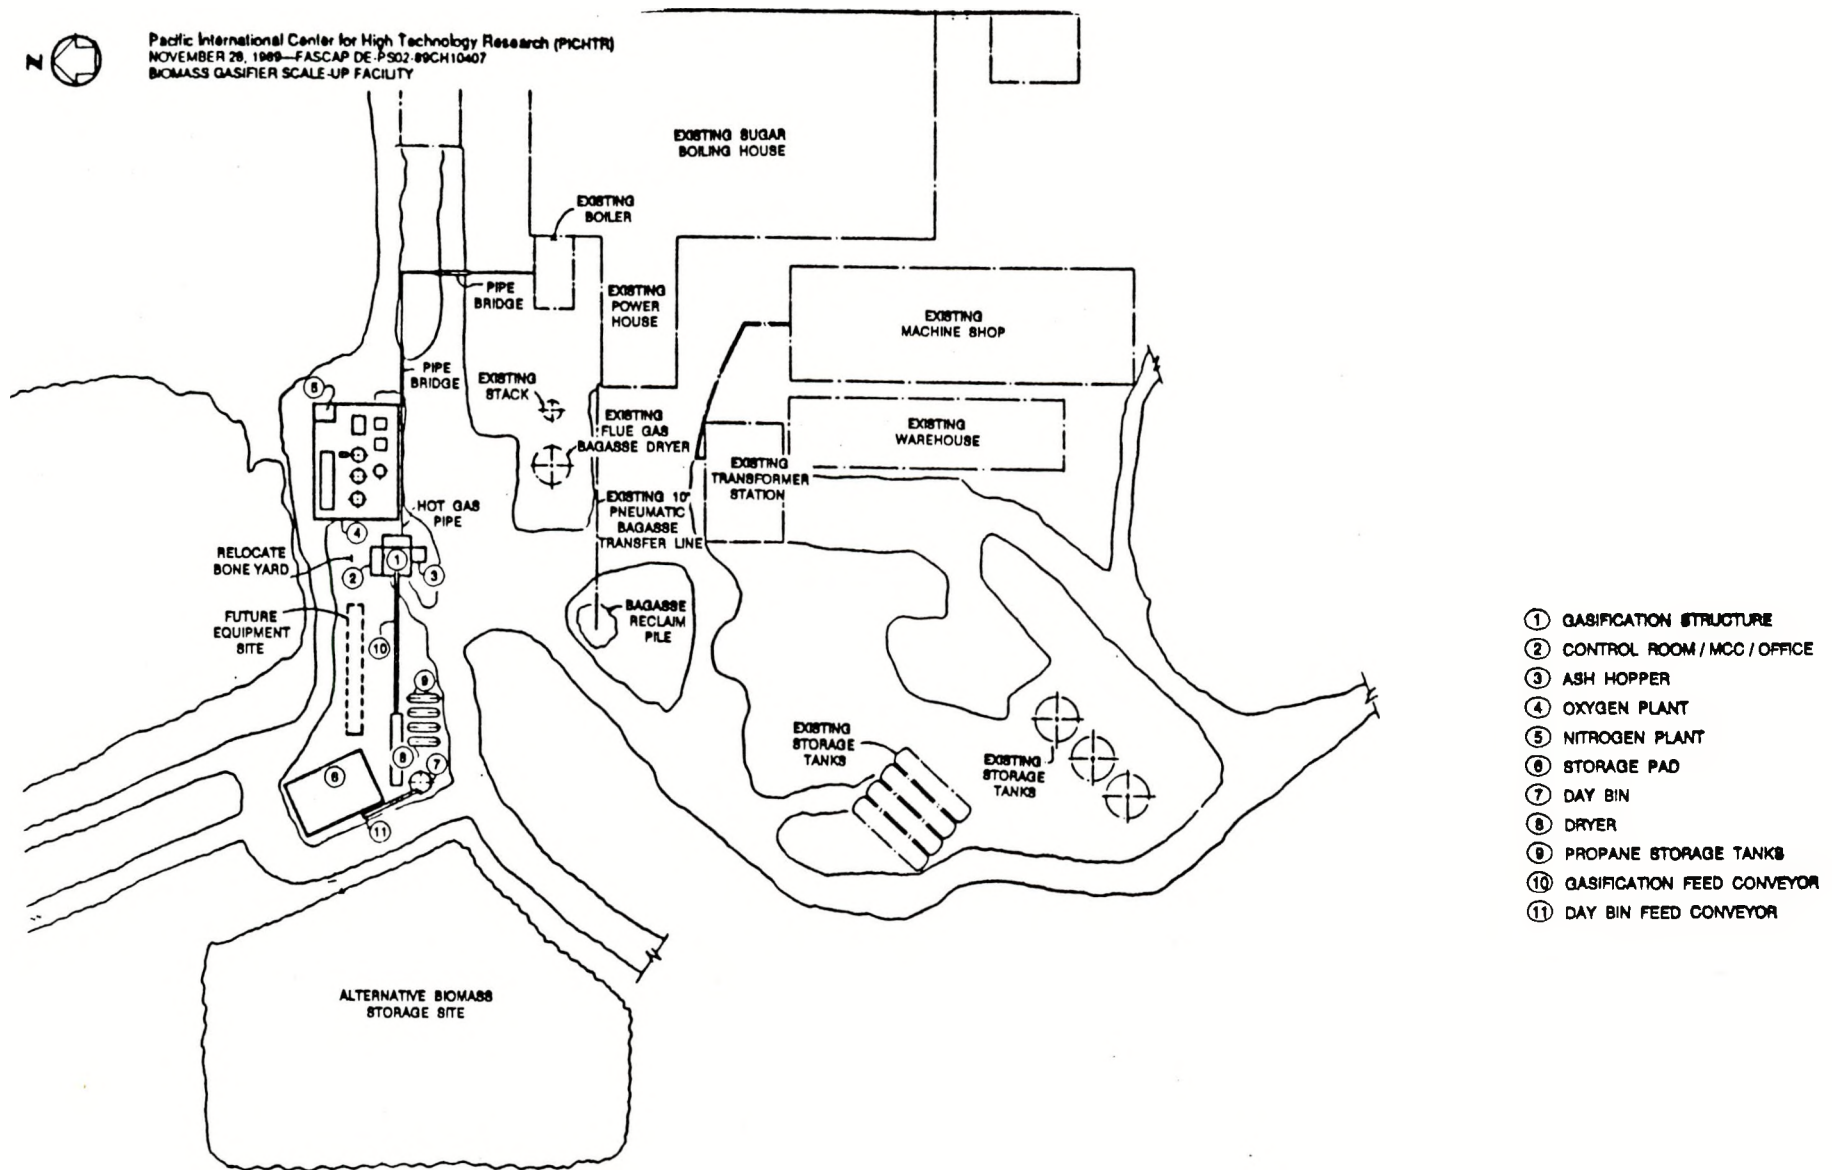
DEMONSTRATION PLANT PLAN FOR SUGAR FACTORY SITE
